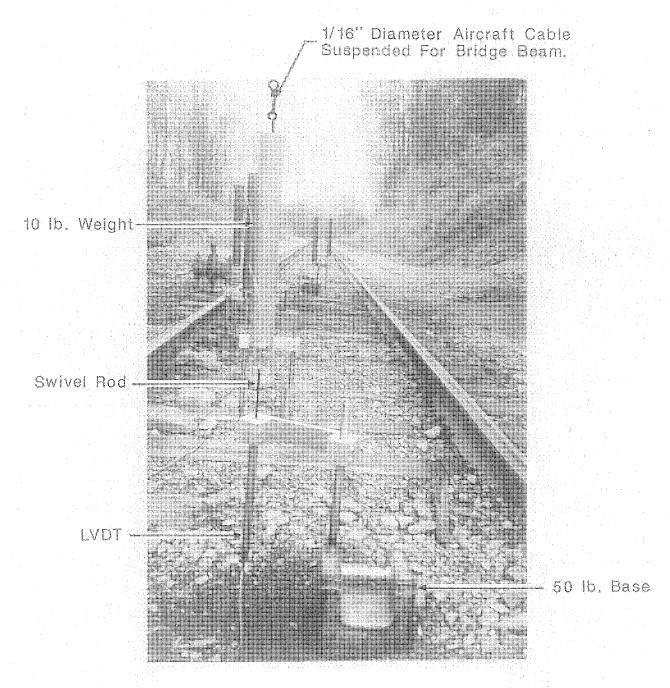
LVDT Set-Up For Measuring Deflection of Bridge Beams.
